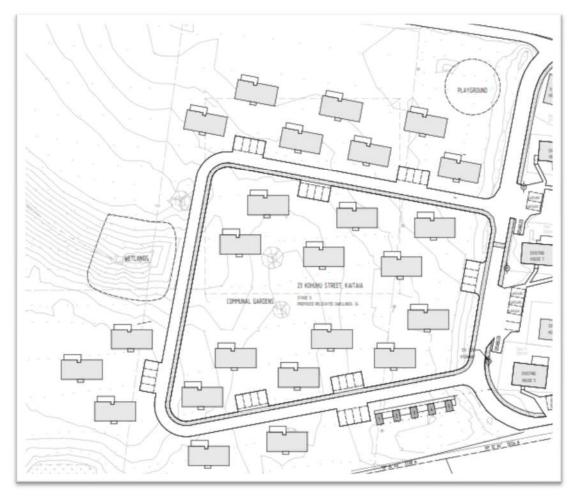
Proposed site layout provided by Ākau Studio, dated 06.10.2020
